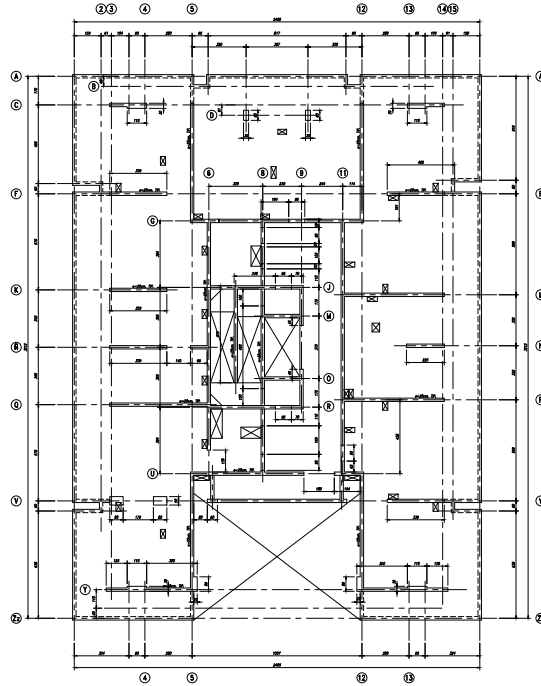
Alto Huerto building (San Pedro de la Paz-Chile) – First story plan view.
